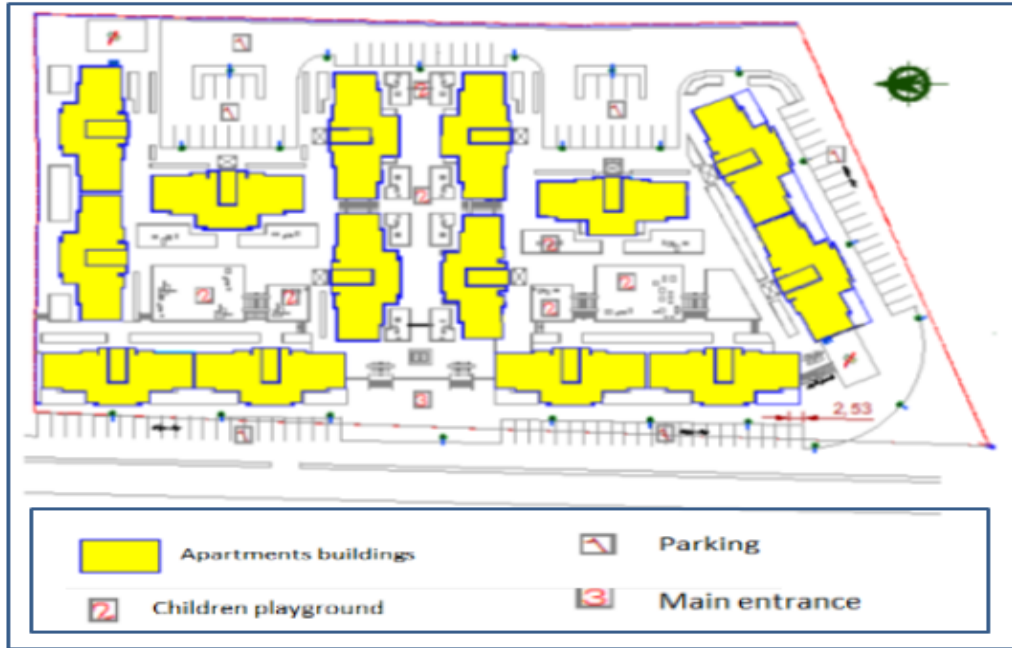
Ghot Ash - Ahaal Site Layout Plan
